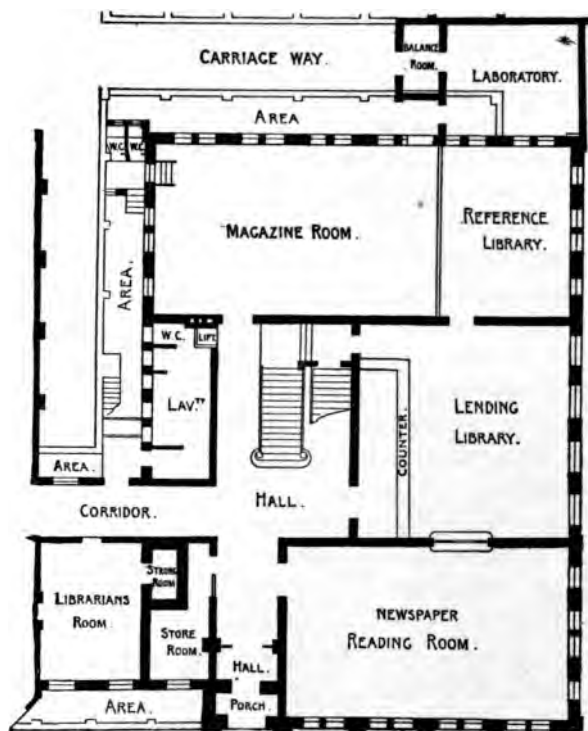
Ground floor plan of the Bootle Library and Museum.
